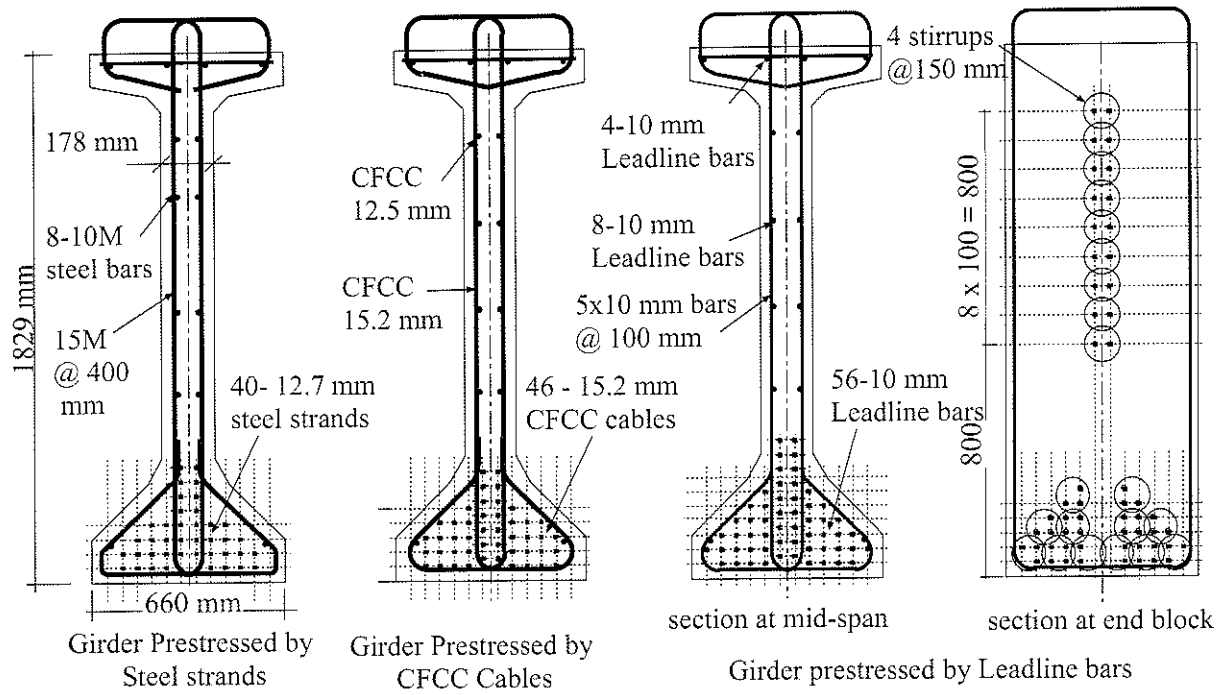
Cross-section of the Taylor bridge girders (Rizkalla *et al.* 1998)
